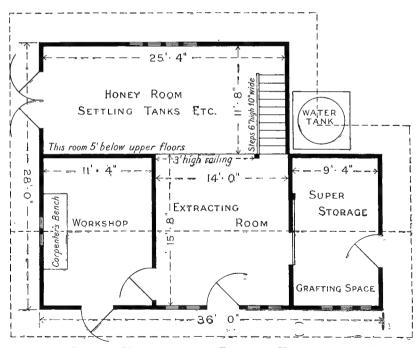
Plan of Honey-house at Tauranga Horticultural Station (slightly altered).
